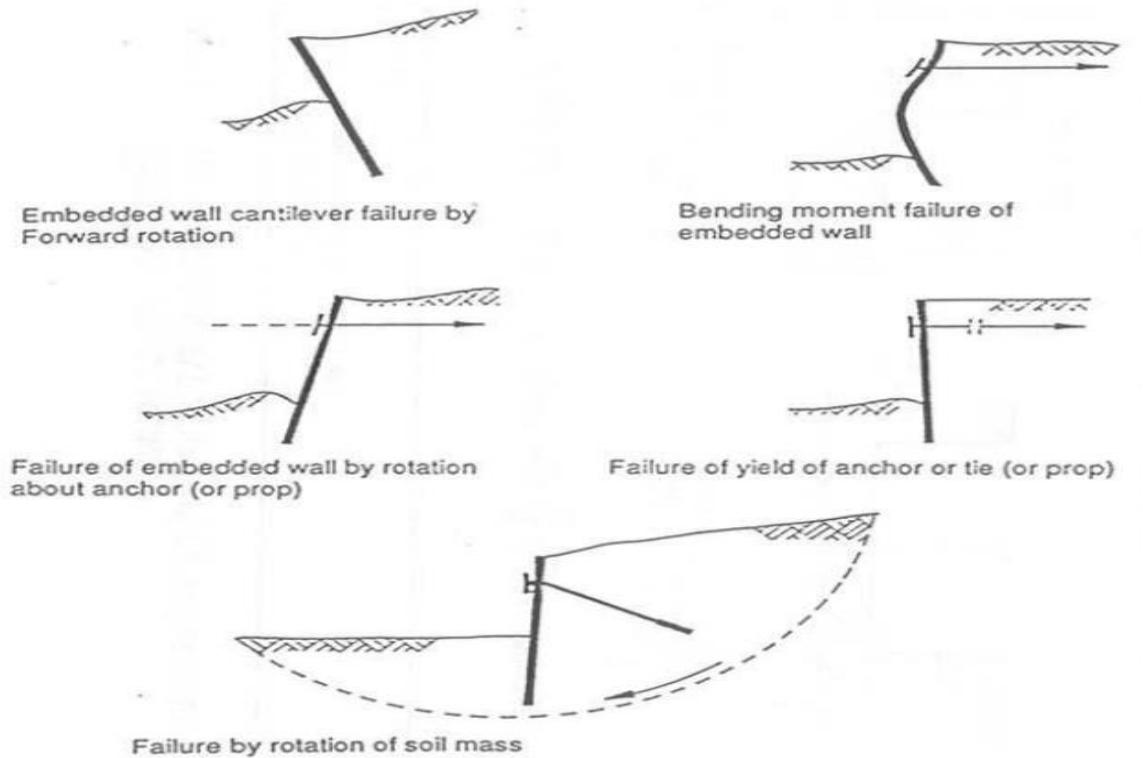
POSSIBLE FAILURE MECHANISMS OF RETAINING WALL
